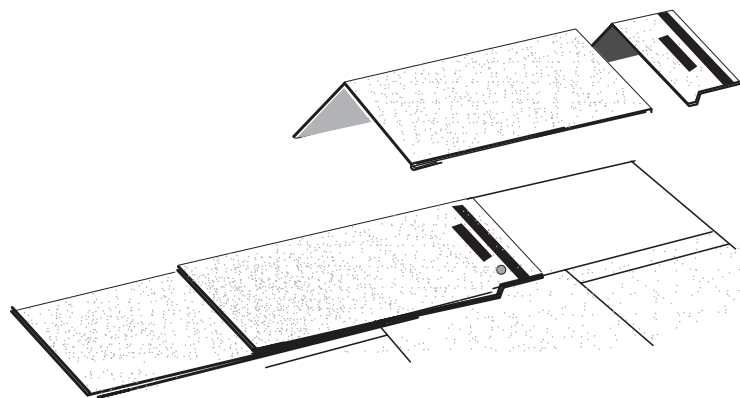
EZ-Ridge™ Shingle Cut to Create an End Cap
